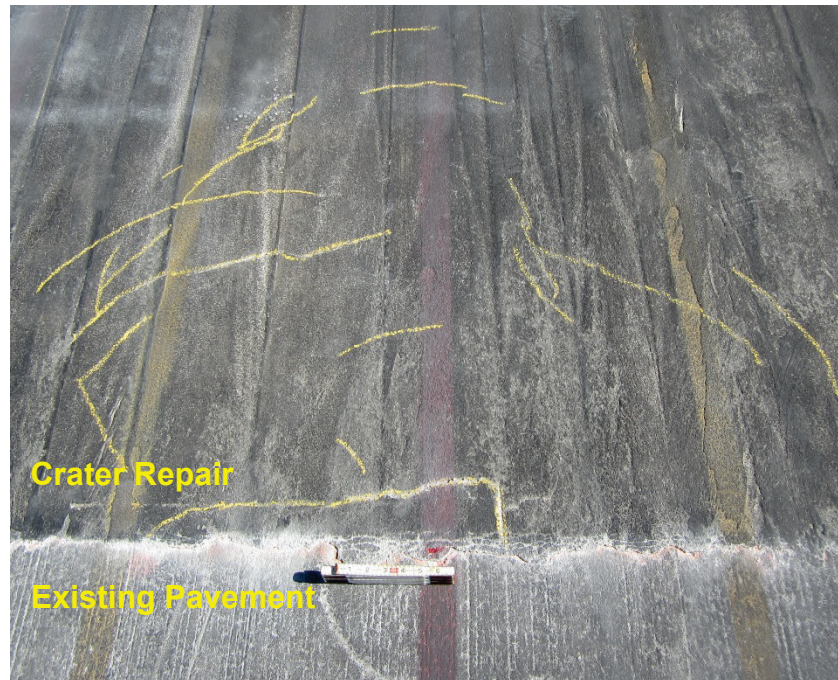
Crater 7, 112 passes, low-severity joint spalling and cracking.
